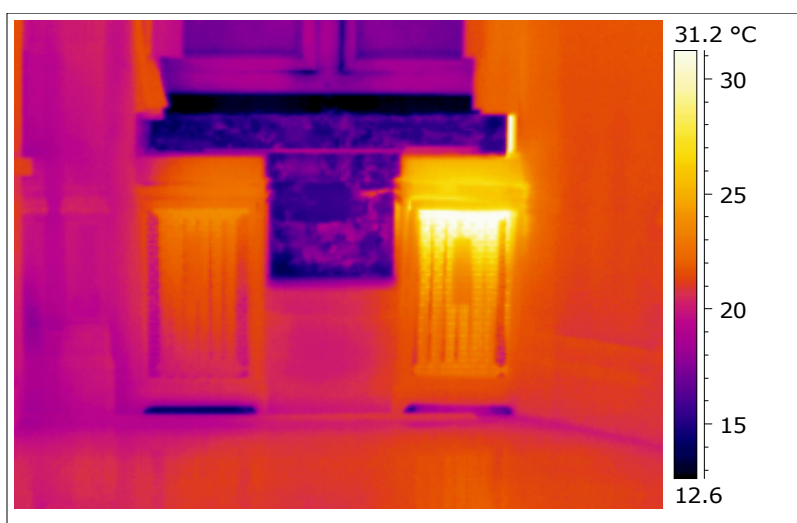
; IRT North-East façade; indoor wall surface damage in correspondence of the window (see table 12 for details)
